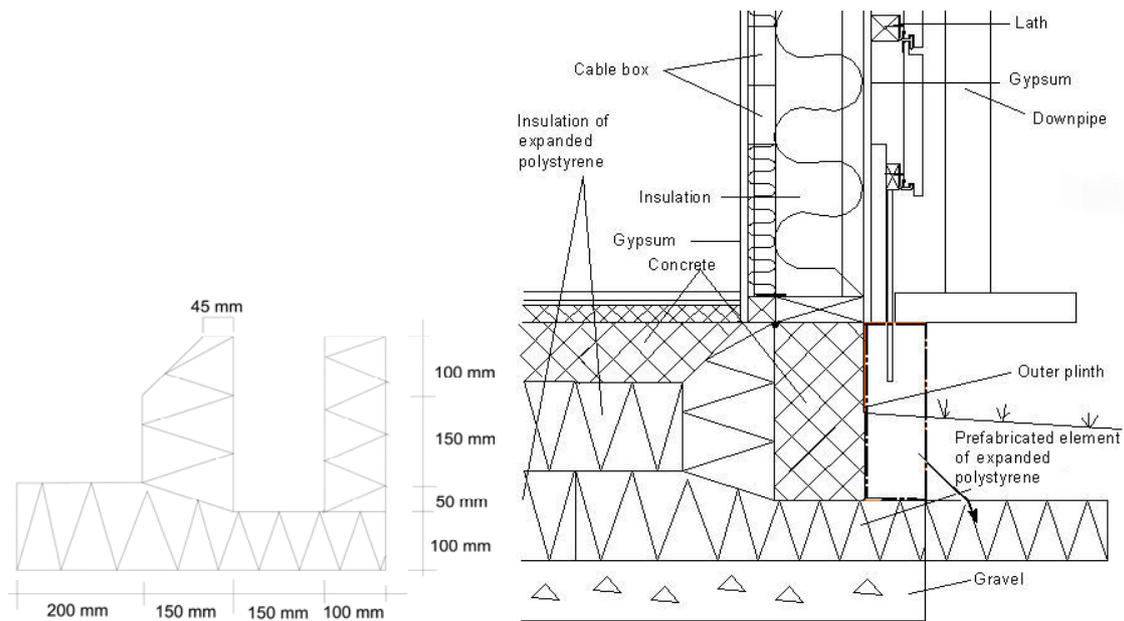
a): left, the prefabricated EPS element, b): right, the EPS element used as the strip foundation of a traditional wood-stud wall with mineral fiber insulation.
